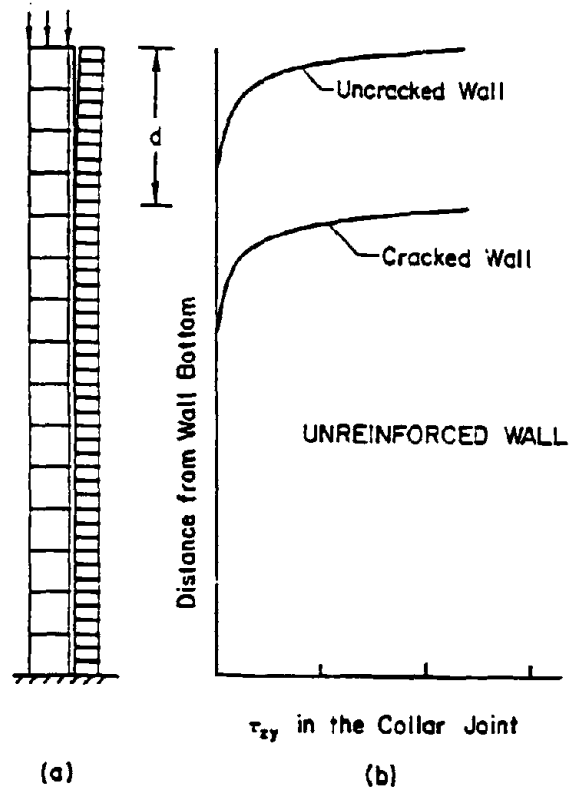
Collar Joint Shear Stress Distribution in a Cracked and Uncracked Unreinforced Wall
